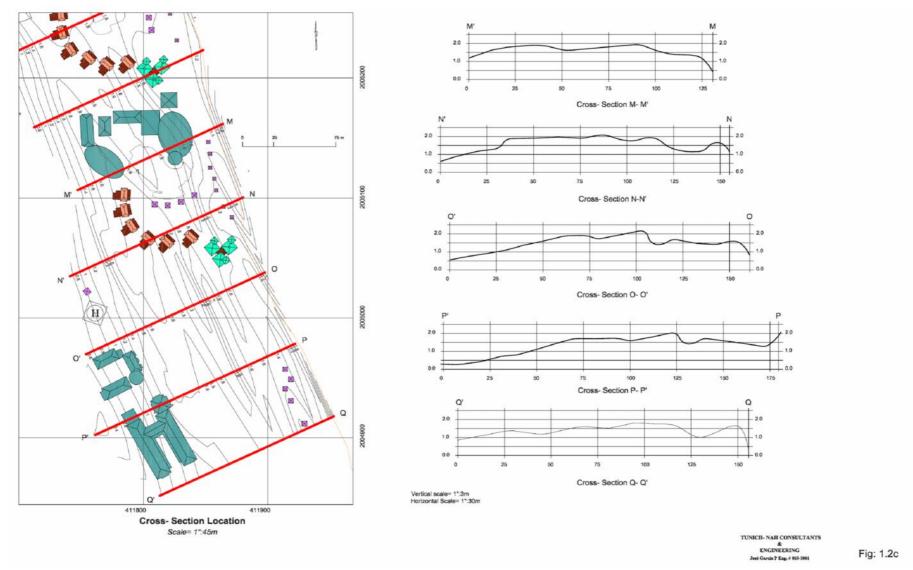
Elevation Contours in relation to Placement of Buildings (Cont'd)
